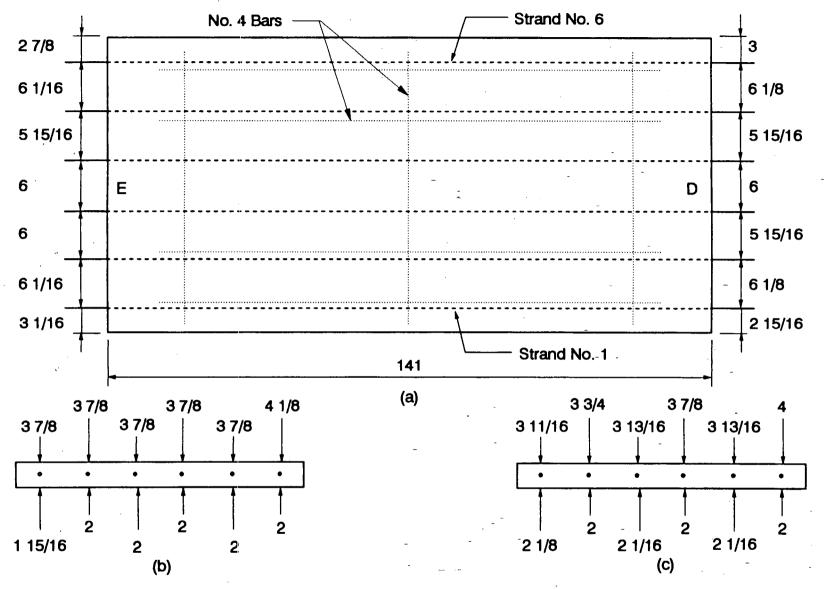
Specimen No. 7-6.0DU-3 (dimensions shown in inches):
